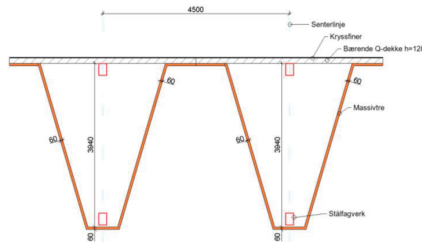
Section a steel truss with CLT claddings as an alternative structural concept.
